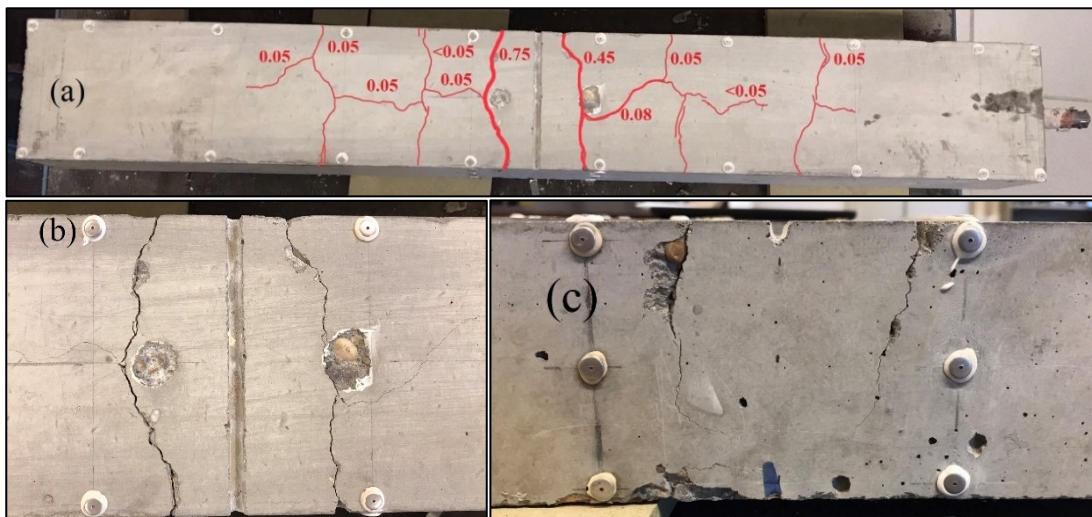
CN3 cracks configuration: (a) Mapping, (b) Main crack top view, (c) Main crack lateral view
